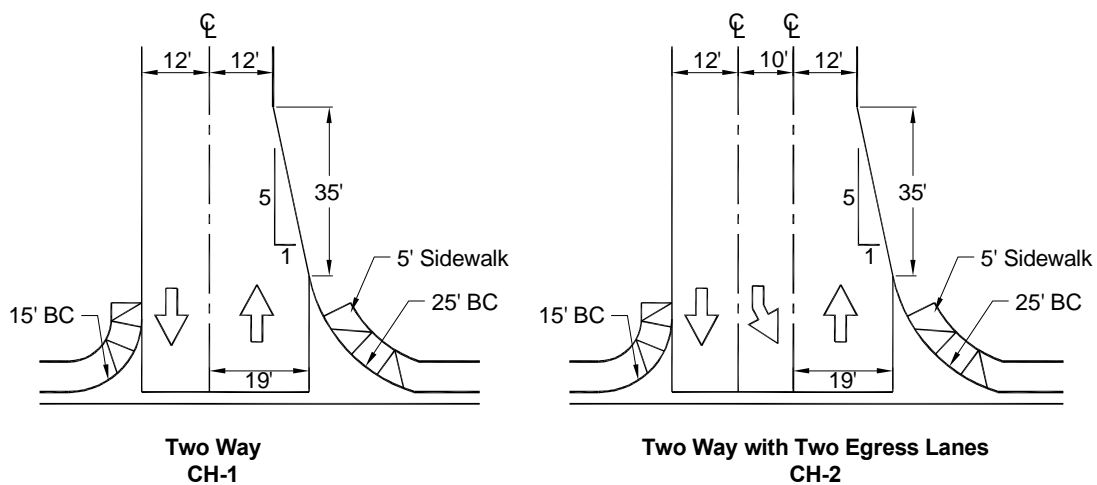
TYPE CH TWO WAY DRIVEWAYS
